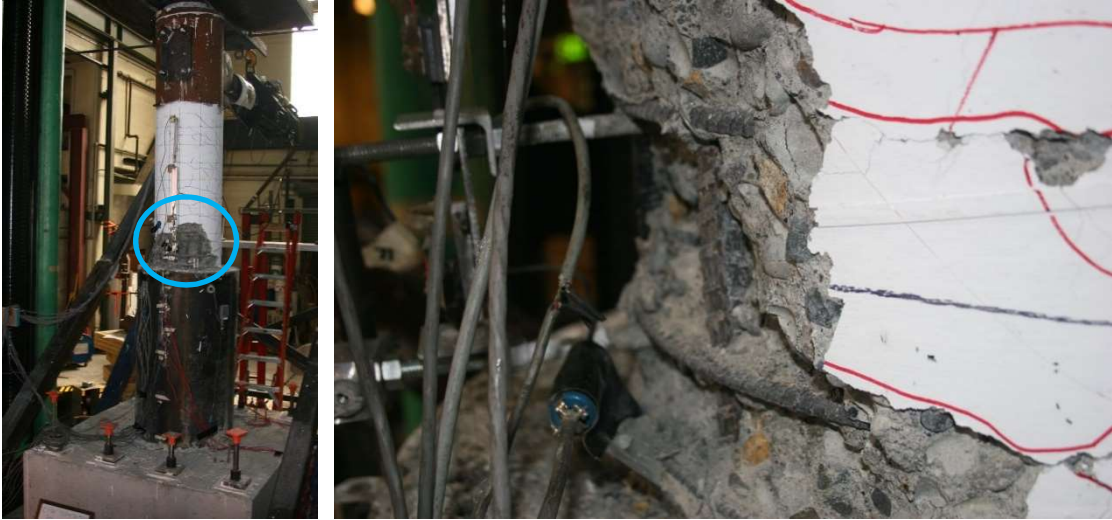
Specimen 30-21-LD Buckled Longitudinal Reinforcement on Southern Side of Concrete at 5.5% Drift
